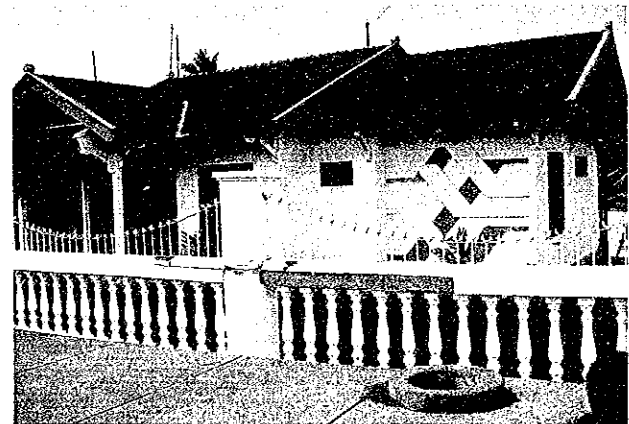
Well-Constructed Reinforced Concrete Masonry Wall Housing; Non Damaged, It Was Very Rare to See Non Damaged Such a Building
